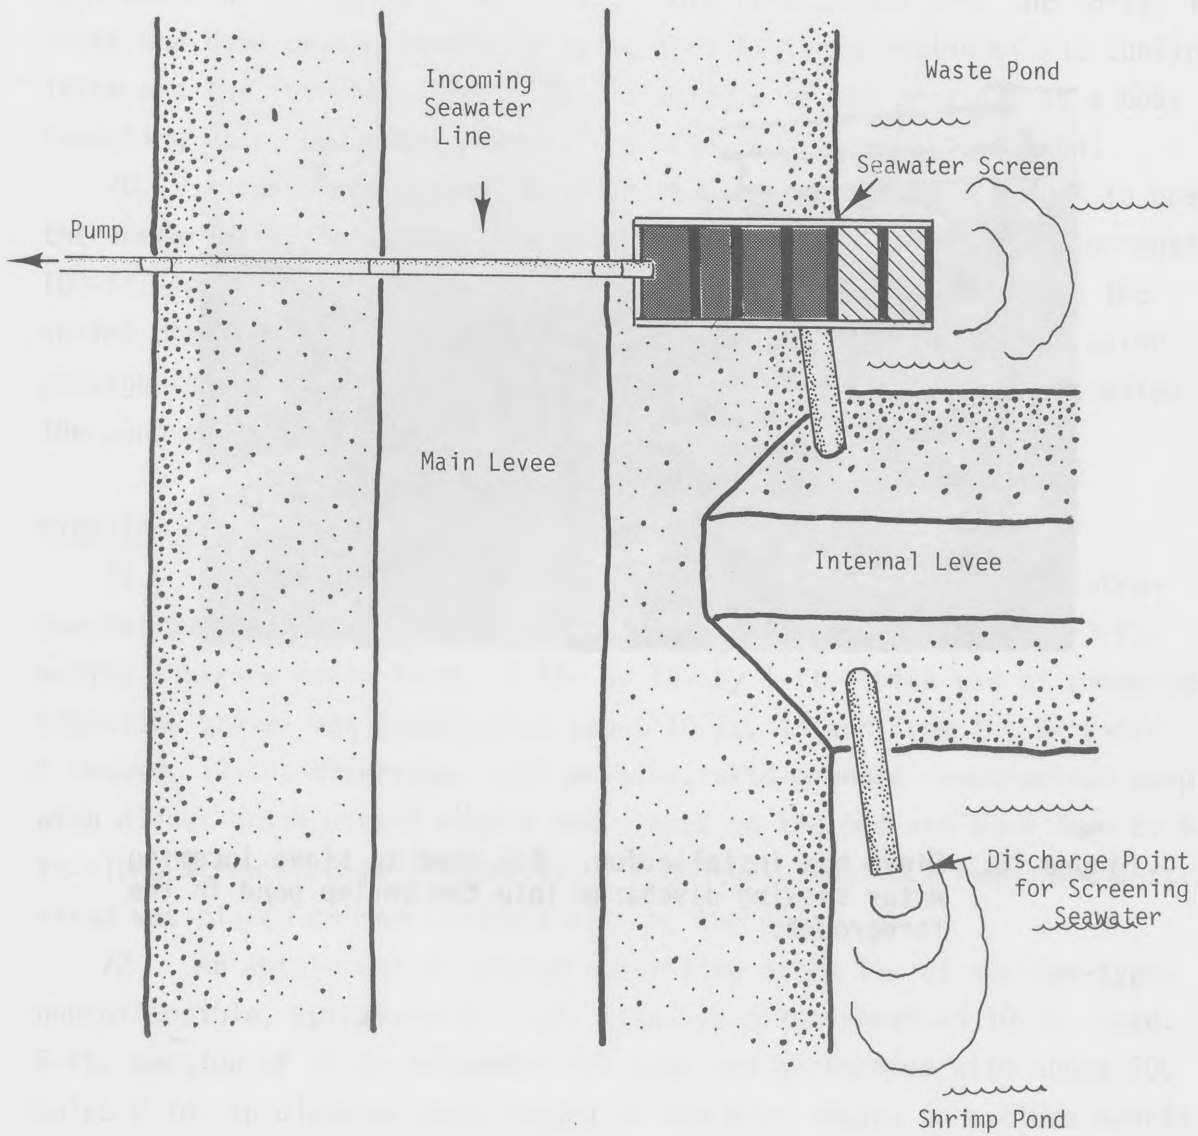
Influent structure design. Plan view of sieve box and associated influent structure layout.
